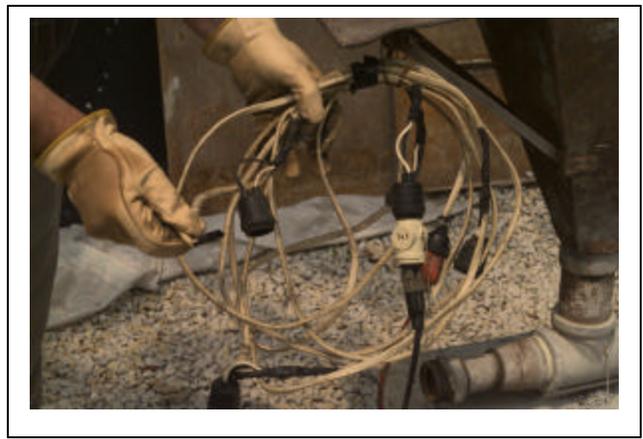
Electrical Wiring Deficiencies at the Drill Site
